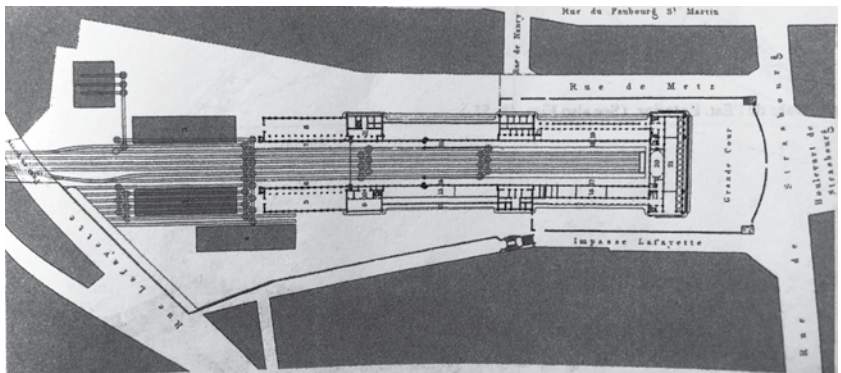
Station of Gare de l'Est - Plan of the tracks level
